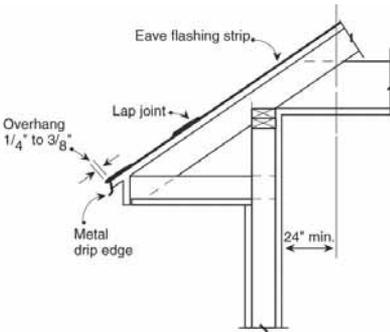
Figure B: Eaves flashing for normal slope using asphalt saturated felt
